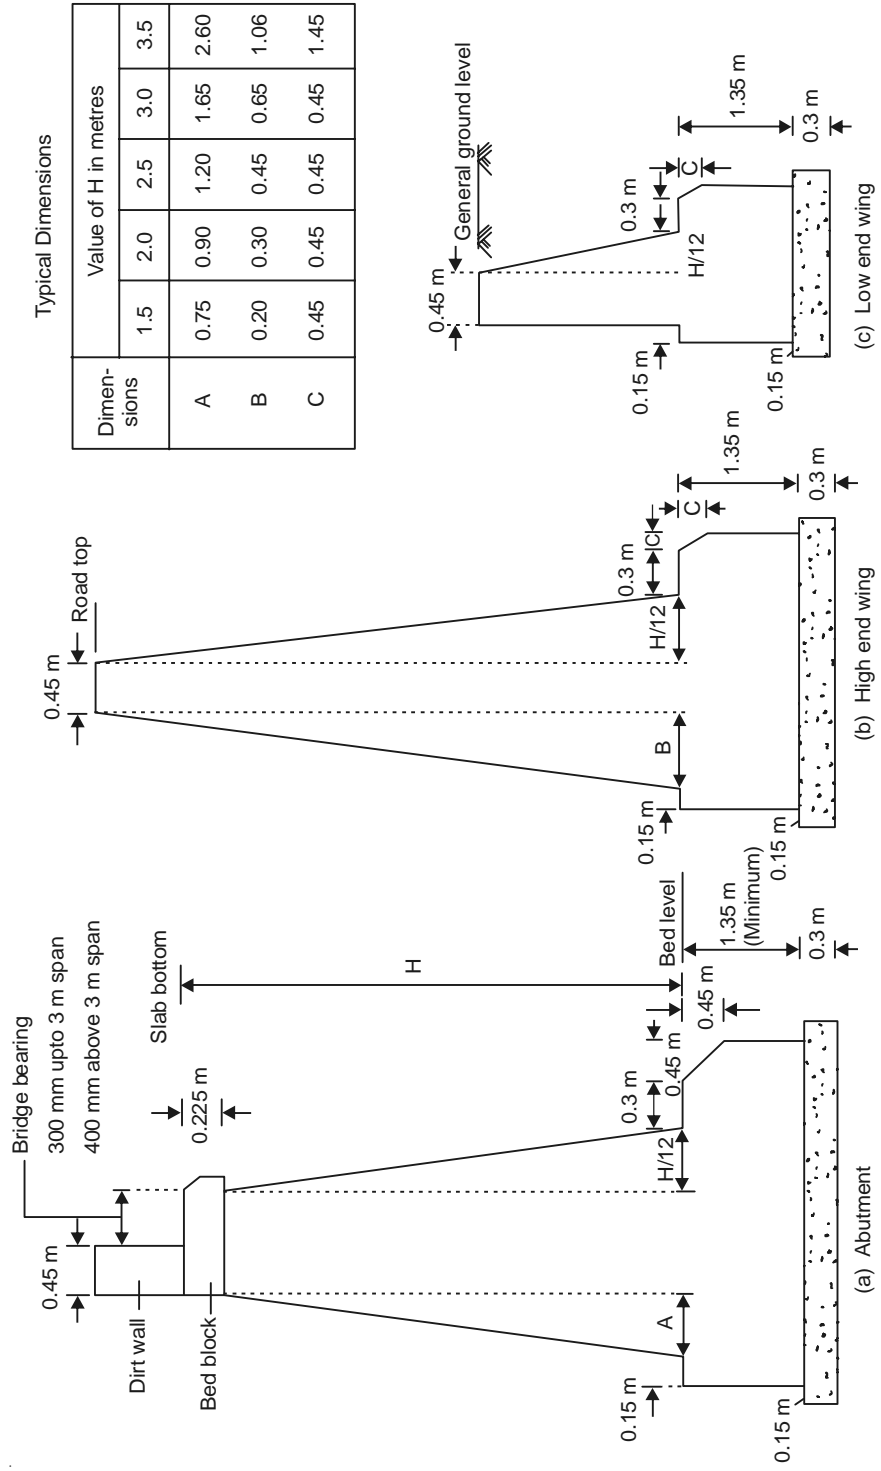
Standard section of abutment and wing walls (Example 7.1).
